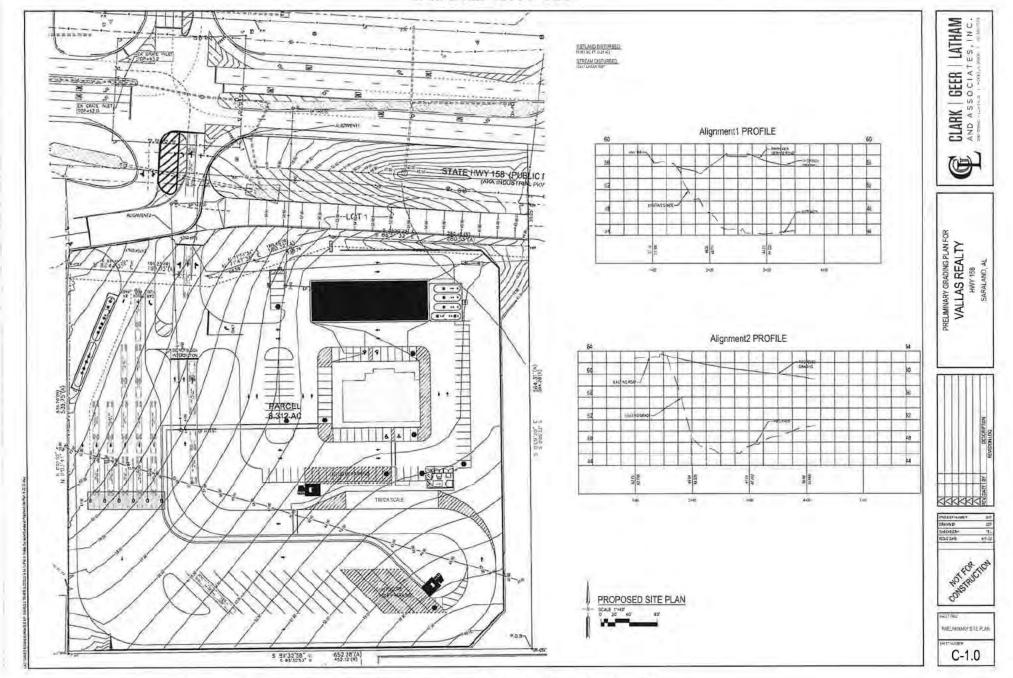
Proposed Site Plan for the Store/Gas Station Truck Stop, Grading Plan
